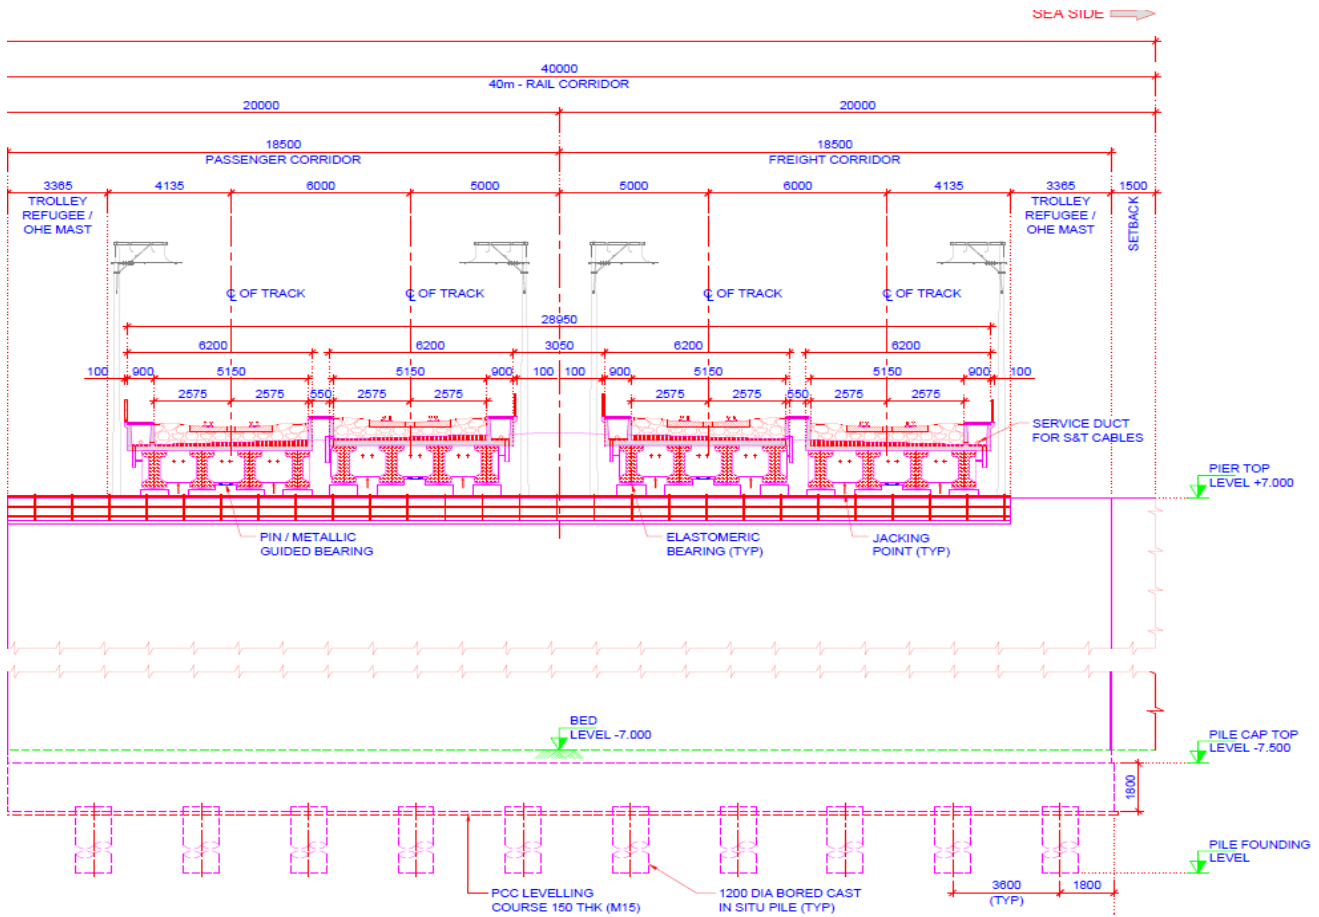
Typical Cross section of Rail bridge at Flood regulator
